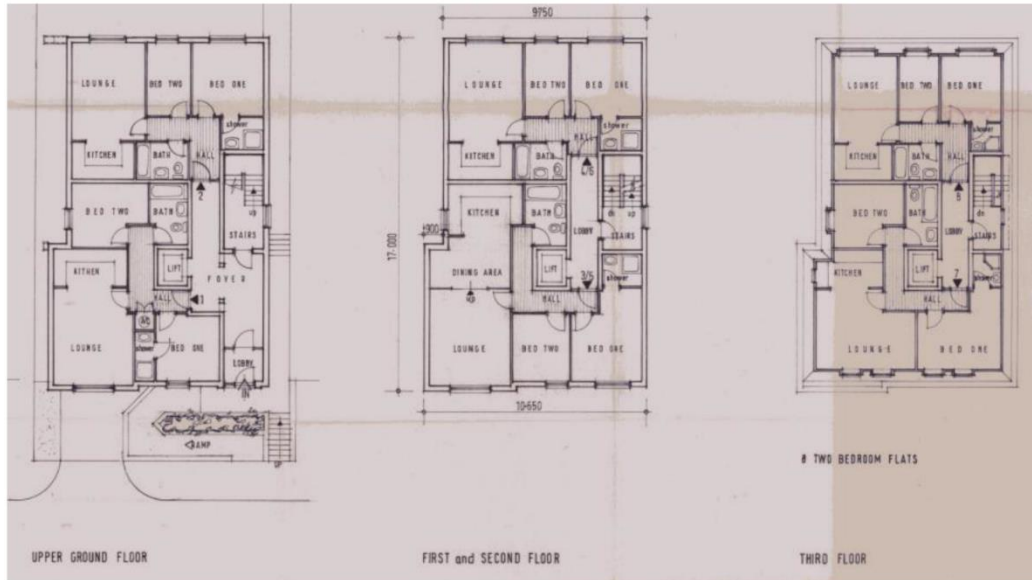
Plans from the Bromley Planning Portal for Simpsons Place, 6 Ringers road (Ref: 99/00350/FULL1)
